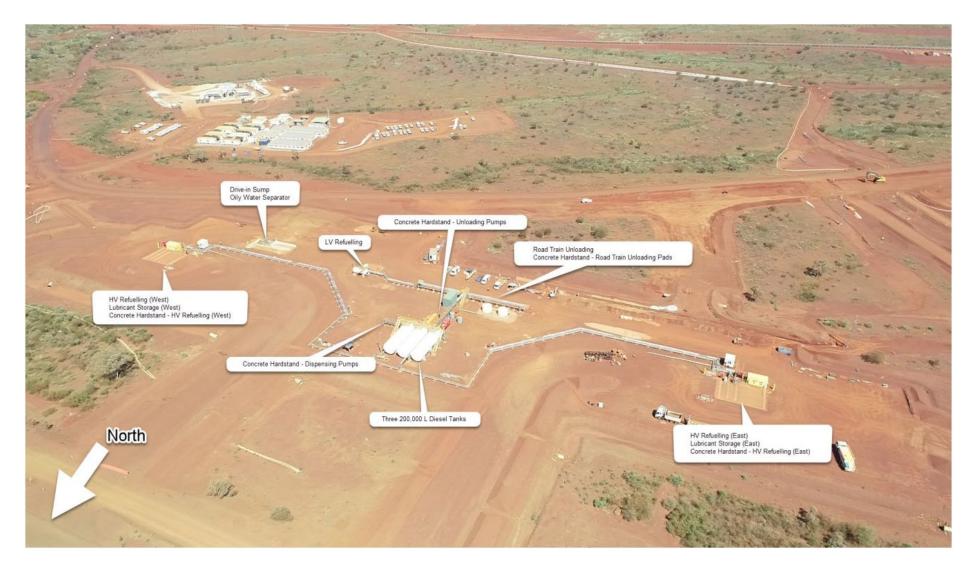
Site layout of Heavy Vehicle Refueling Facility
